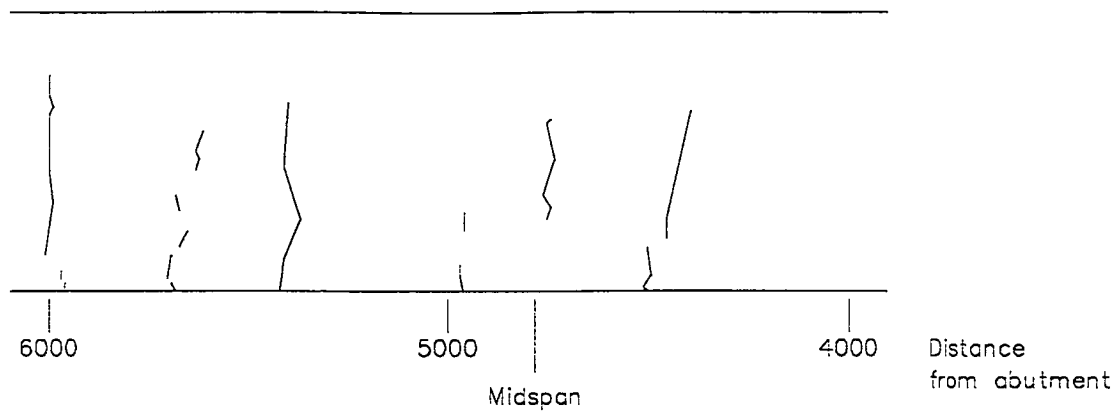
Pre-existing cracks, exterior face of upstream beam
